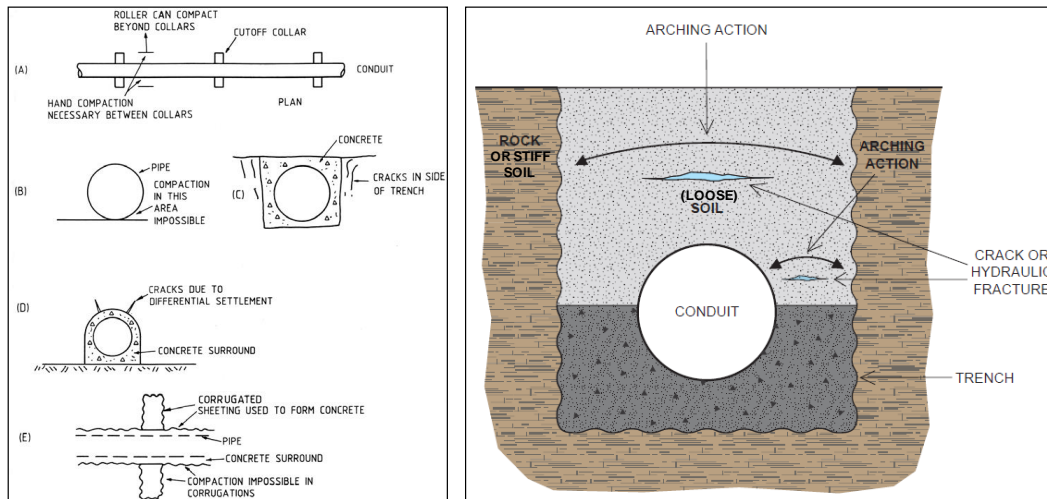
C-15 Some Causes of Piping Failures around Conduits (Fell et al. 2008)
